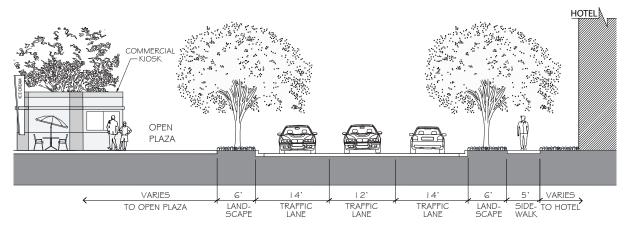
Via Piemonte - South Section - (North of Ontario Center Pkwy) Private Streetscape Section and Plan
